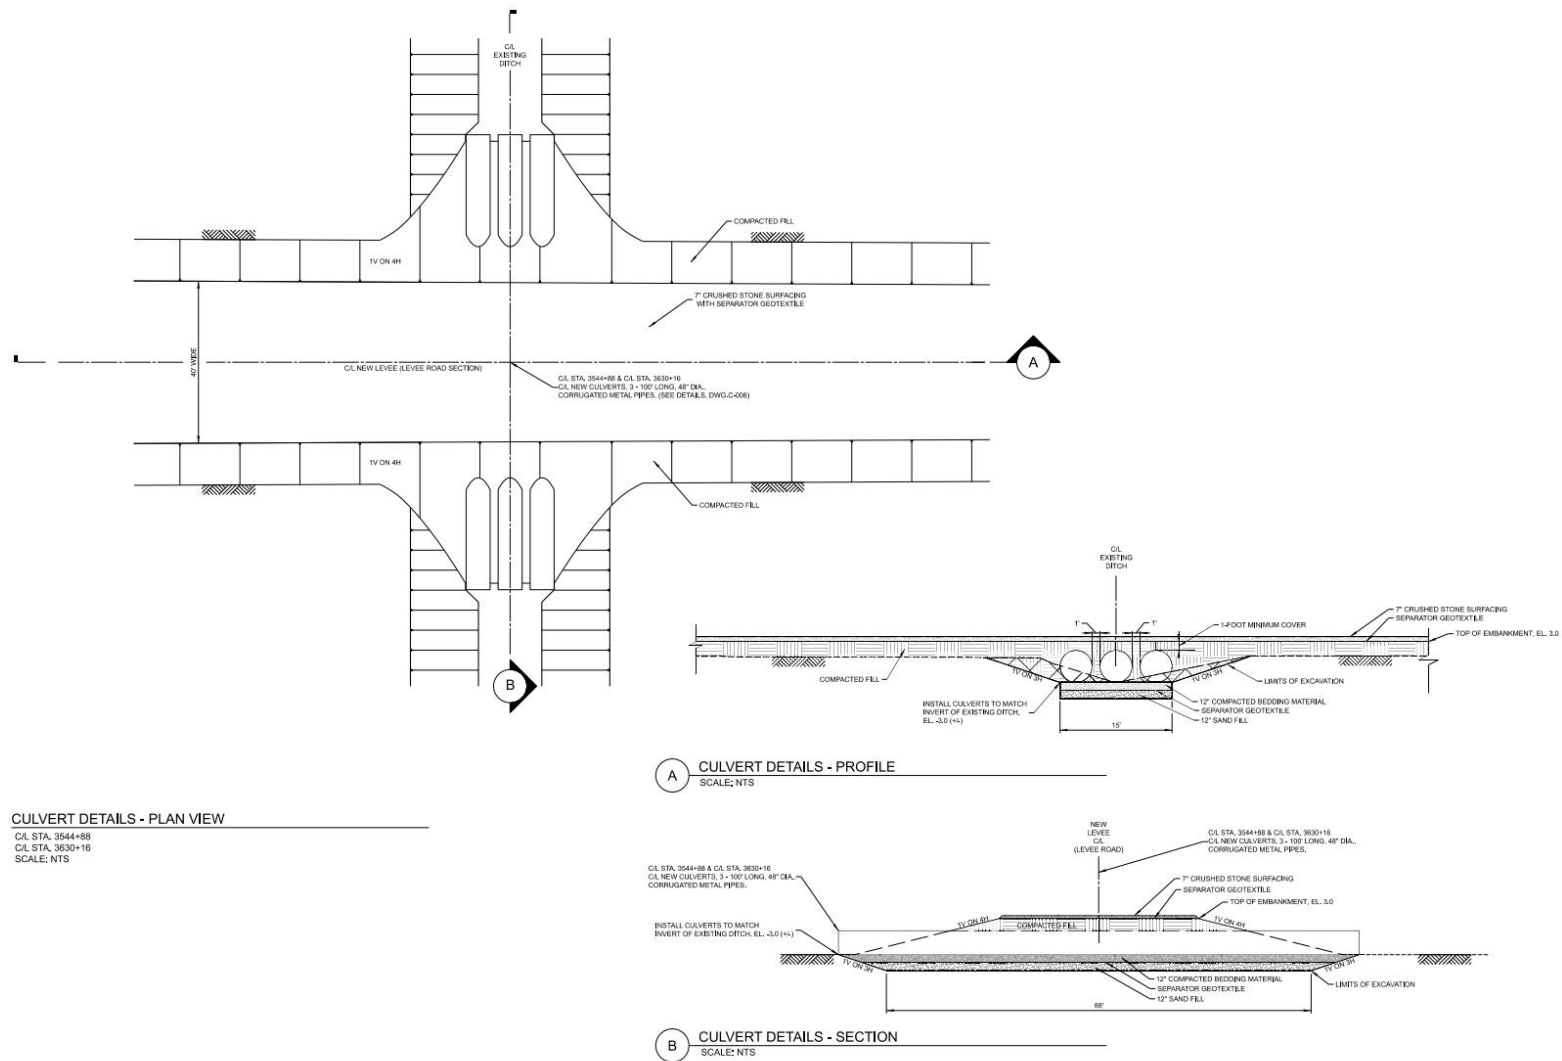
Plan view and cross-section of culverts and temporary roads at canal crossings
